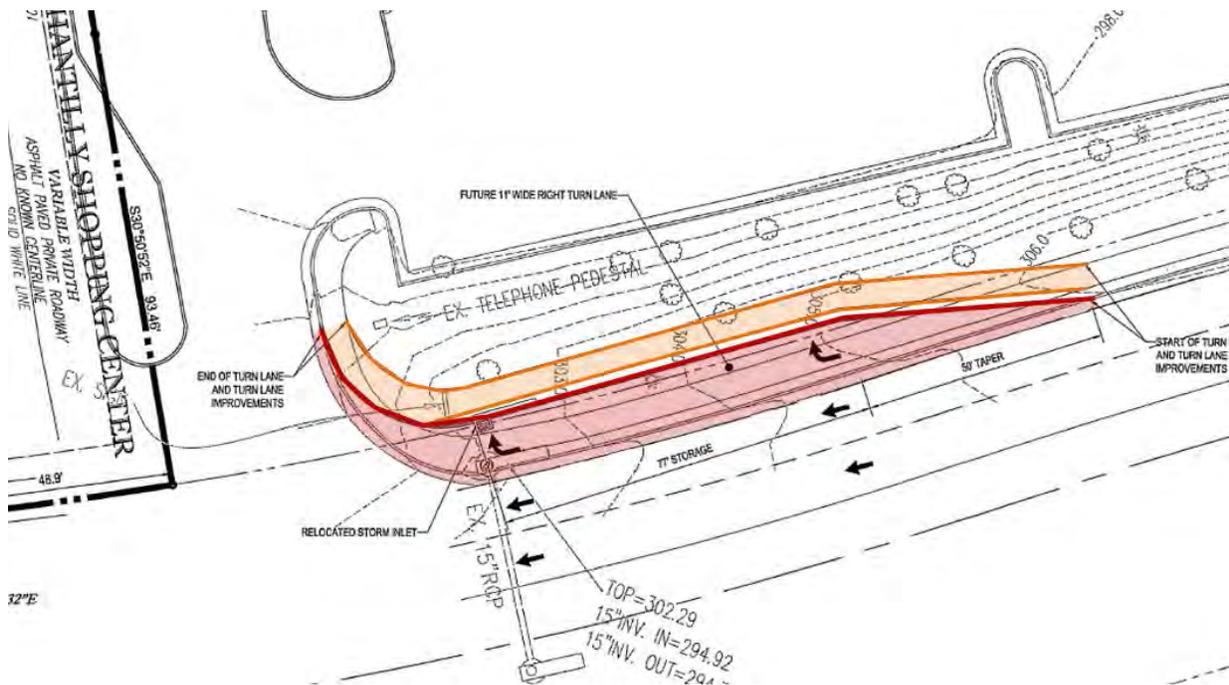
Proposed turn lane and sidewalk relocation on Willard Road.
